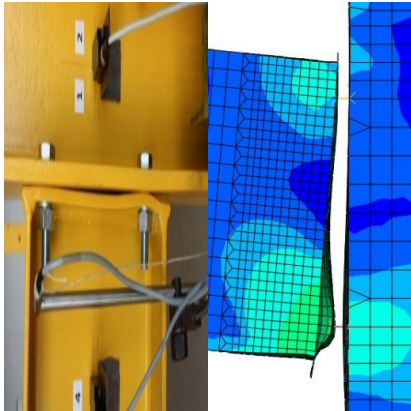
Deformed shape of steel joints with flush end-plates from test and FE-joint, sagging bending
